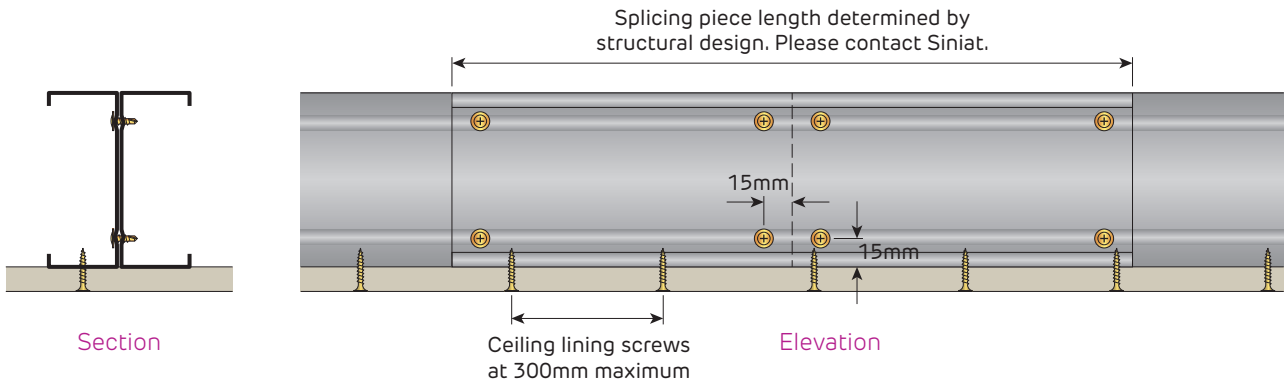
Splicing Steel Ceiling Studs via Back-to-back Method
